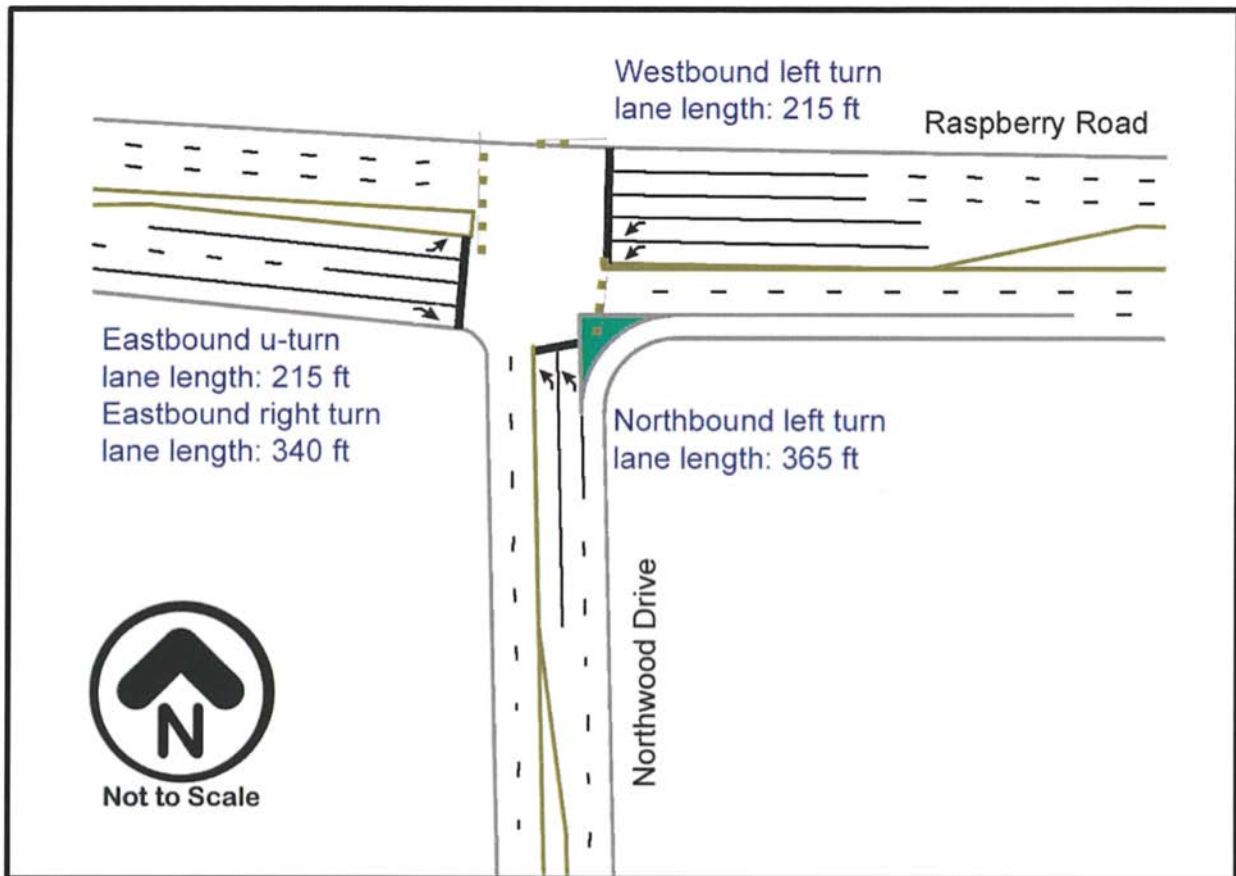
Queue Length for Existing Raspberry Road and Northwood Street Intersection
